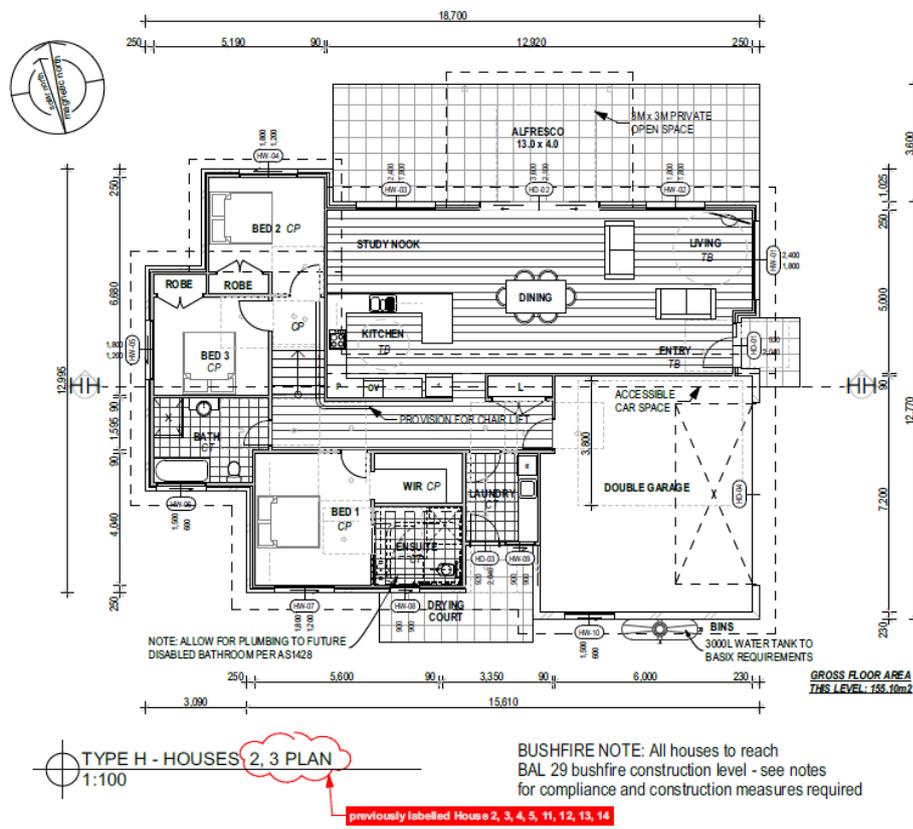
Proposed Housing Type H Floor Plan (Dwellings 2 & 3)
